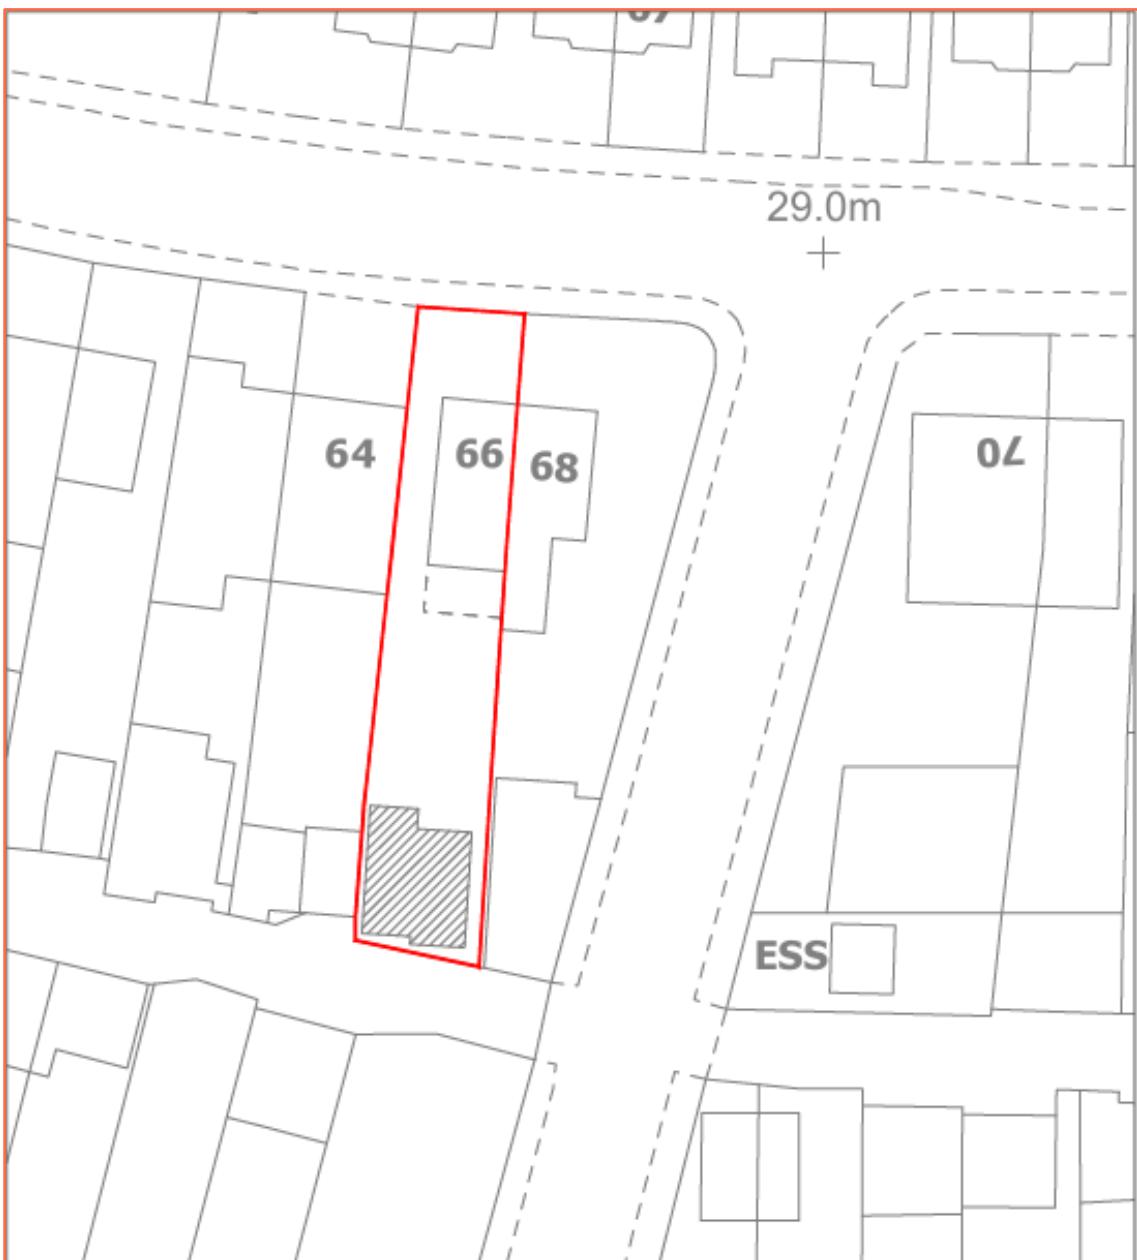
Proposed site plan for the outbuilding (Source: AMBA Architecture)
